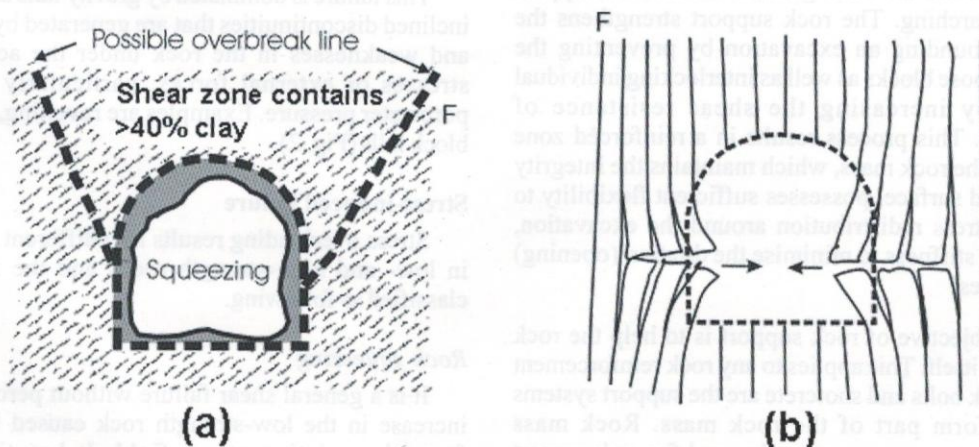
Stress-induced failures: (a). Squeezing in a shear zone containing greater than 40% of clay; (b). Rock burst resulting into the buckling of walls due to a high horizontal stress in very strong and brittle quartzite. F= foliation
